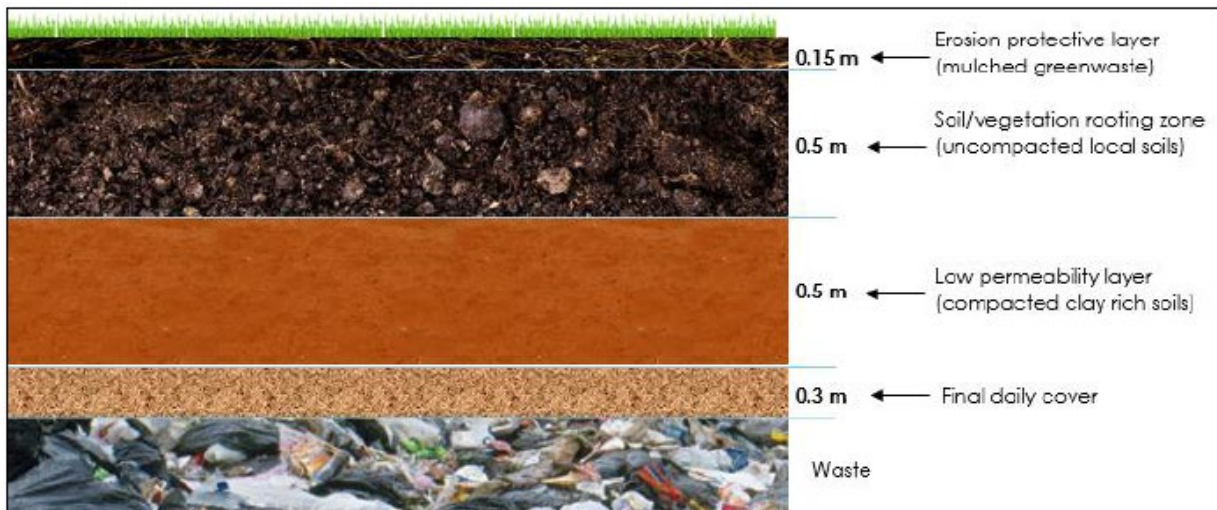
Structure of the DWER approved cap for the Buller Road Waste Facility.
